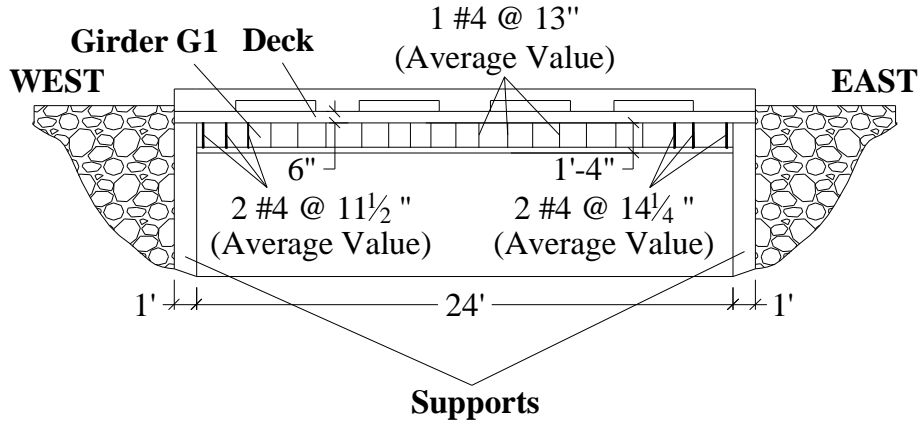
Shear Reinforcement in the Outer Girders (G1 and G4)
